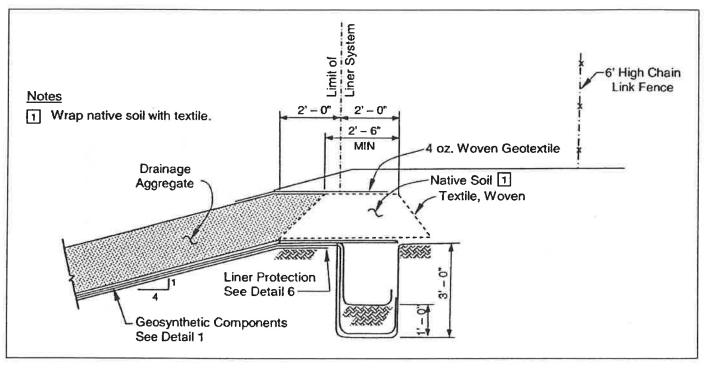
Detail 2 - Landfill Liner System Termination (South and East Sides)
